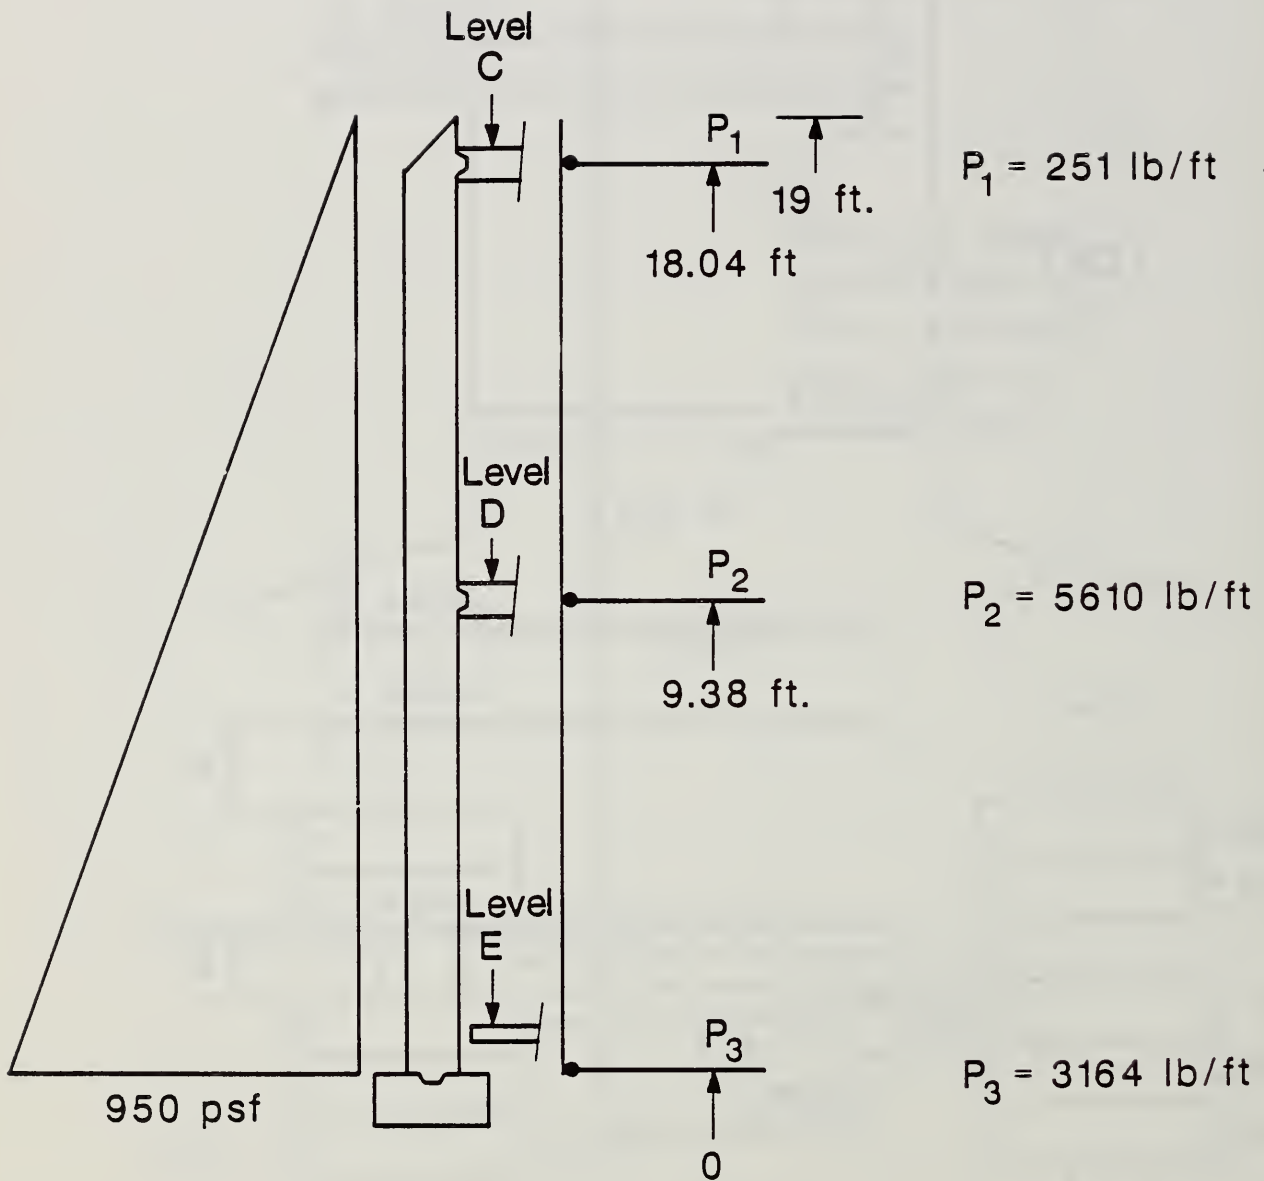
Soil pressure acting on basement wall - North side of building
